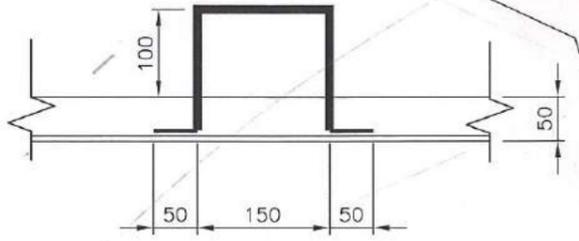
DETAIL OF TRENCH COVER SLAB FOR SECTION 1-1 & 2-2
